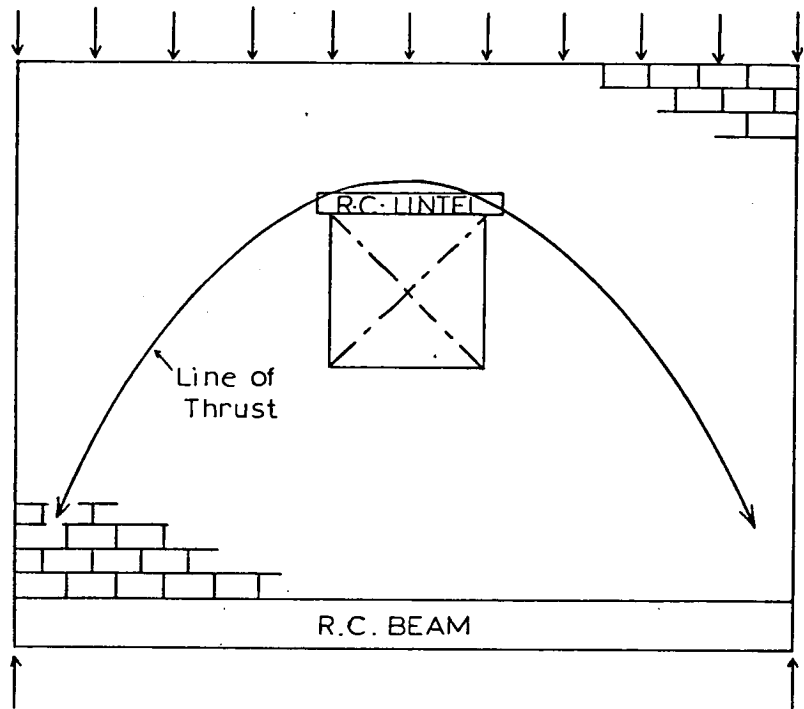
Arching Action in Wall With Central Window Opening.
